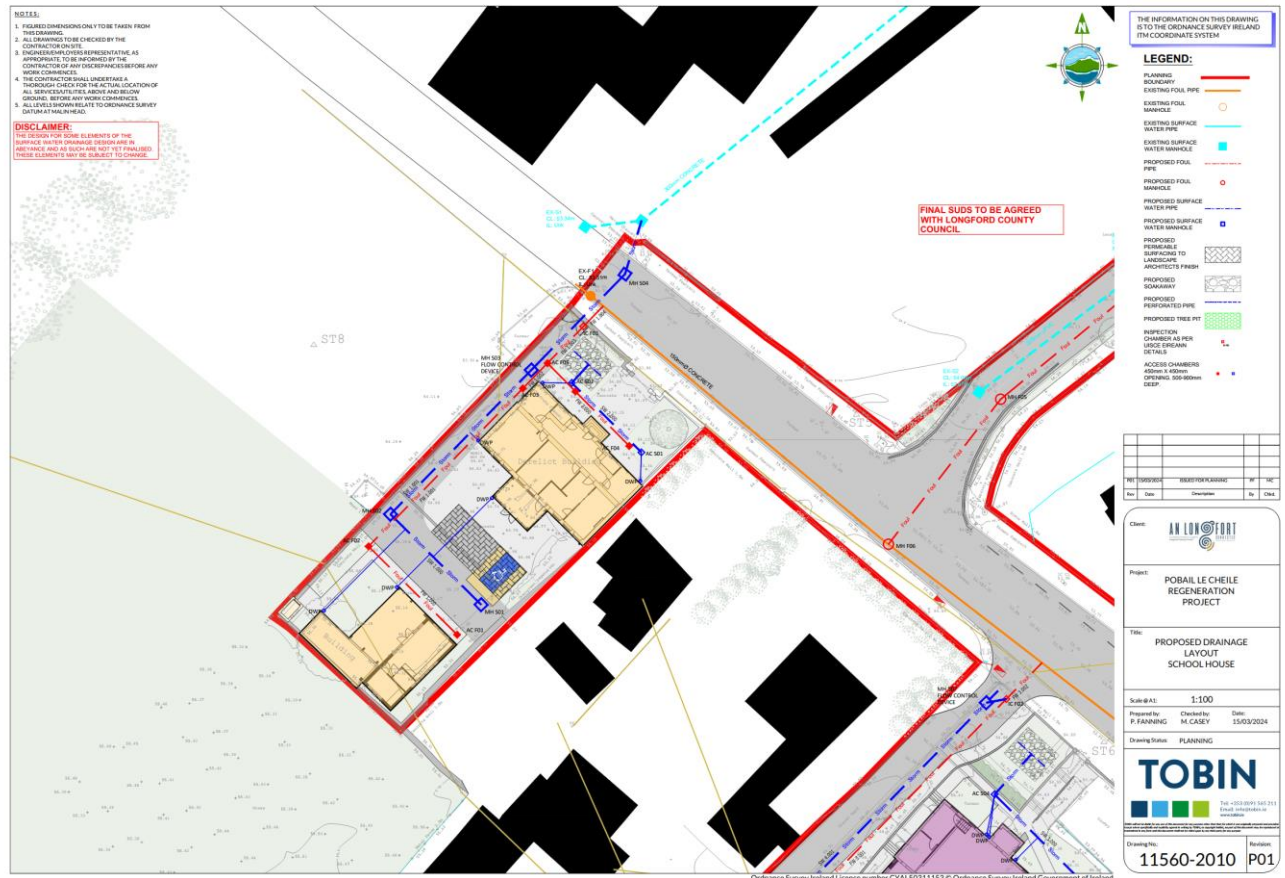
Proposed School House Drainage, drawing 11560-2010
